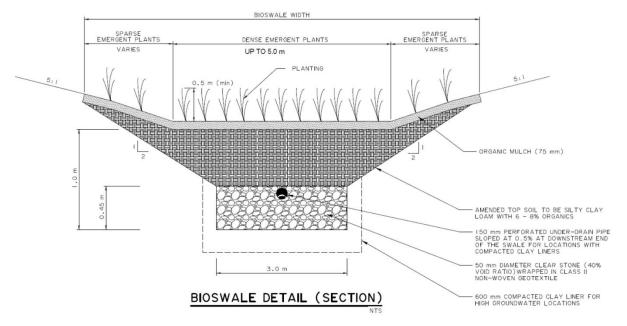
TYPICAL BIOSWALE CROSS-SECTION
